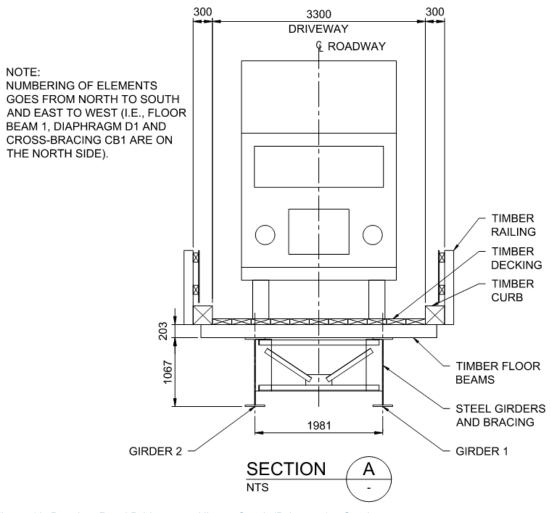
Bayview Road Bridge over Alberta Creek (Driveway) - Section
